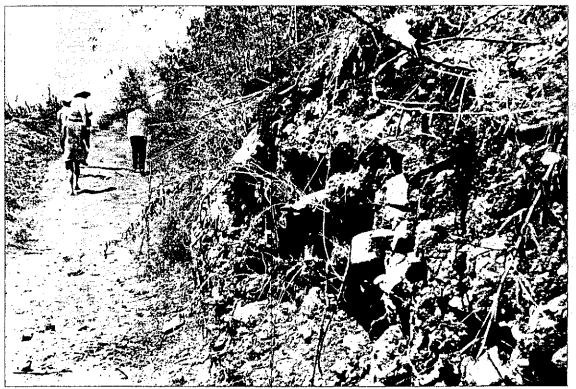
1999 site photo. Packed earth road extends into debris dumped in canyon.
